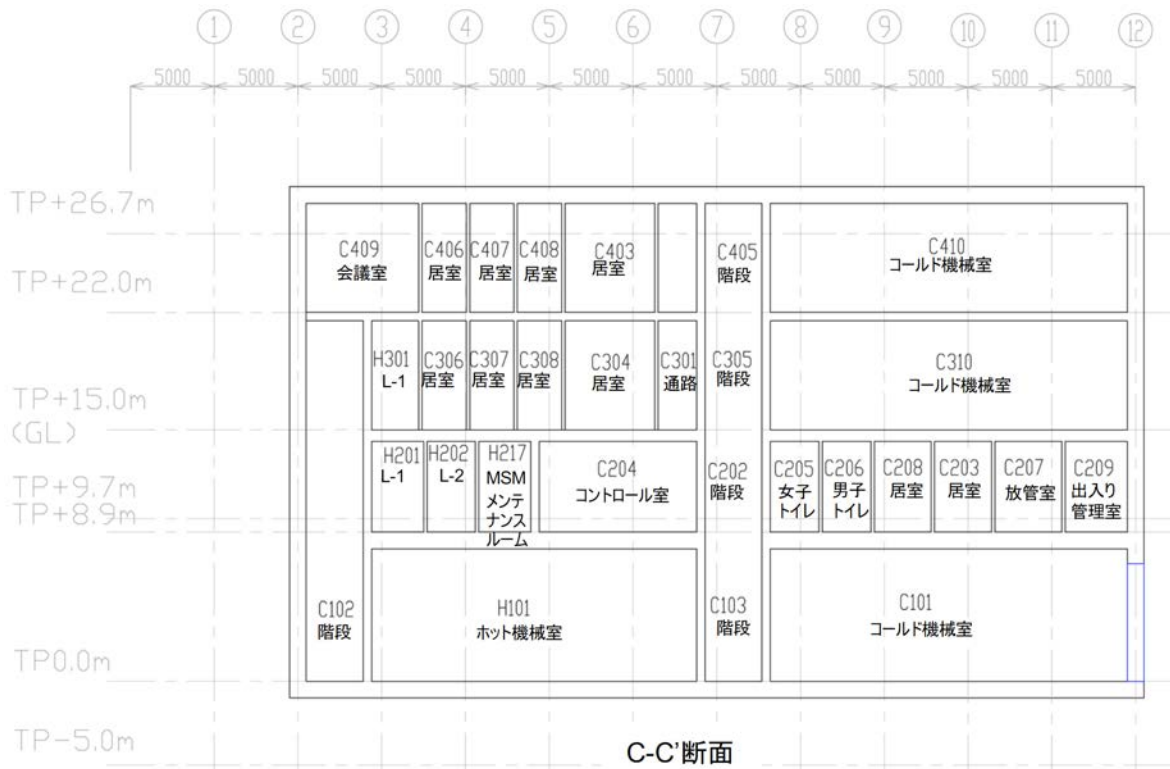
Elevation view of PIE facility (C-C').
